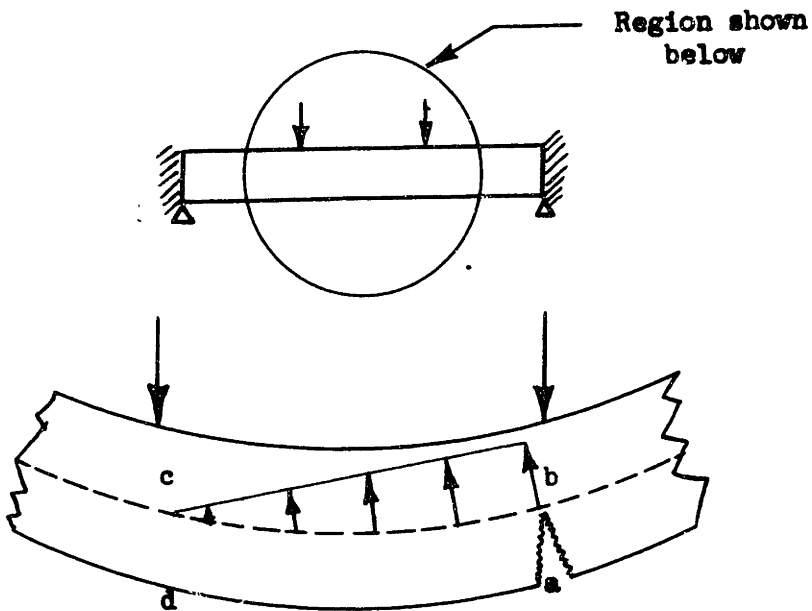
Loaded Beam Showing Forces Induced by Curvature
